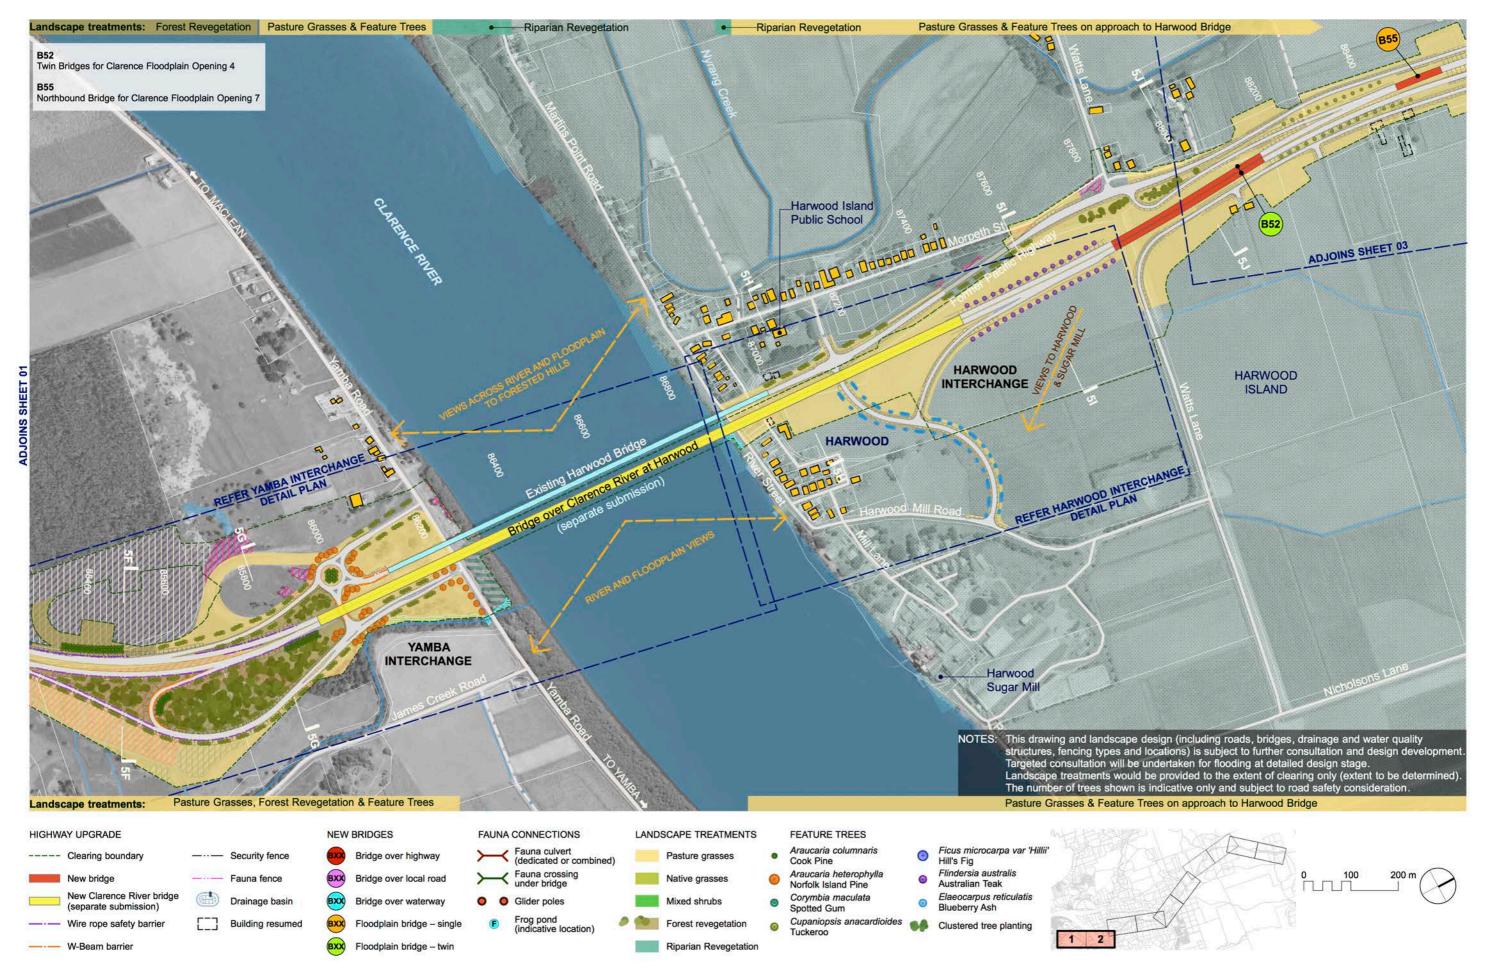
Landscape and urban design concept plan (10 sheets)
